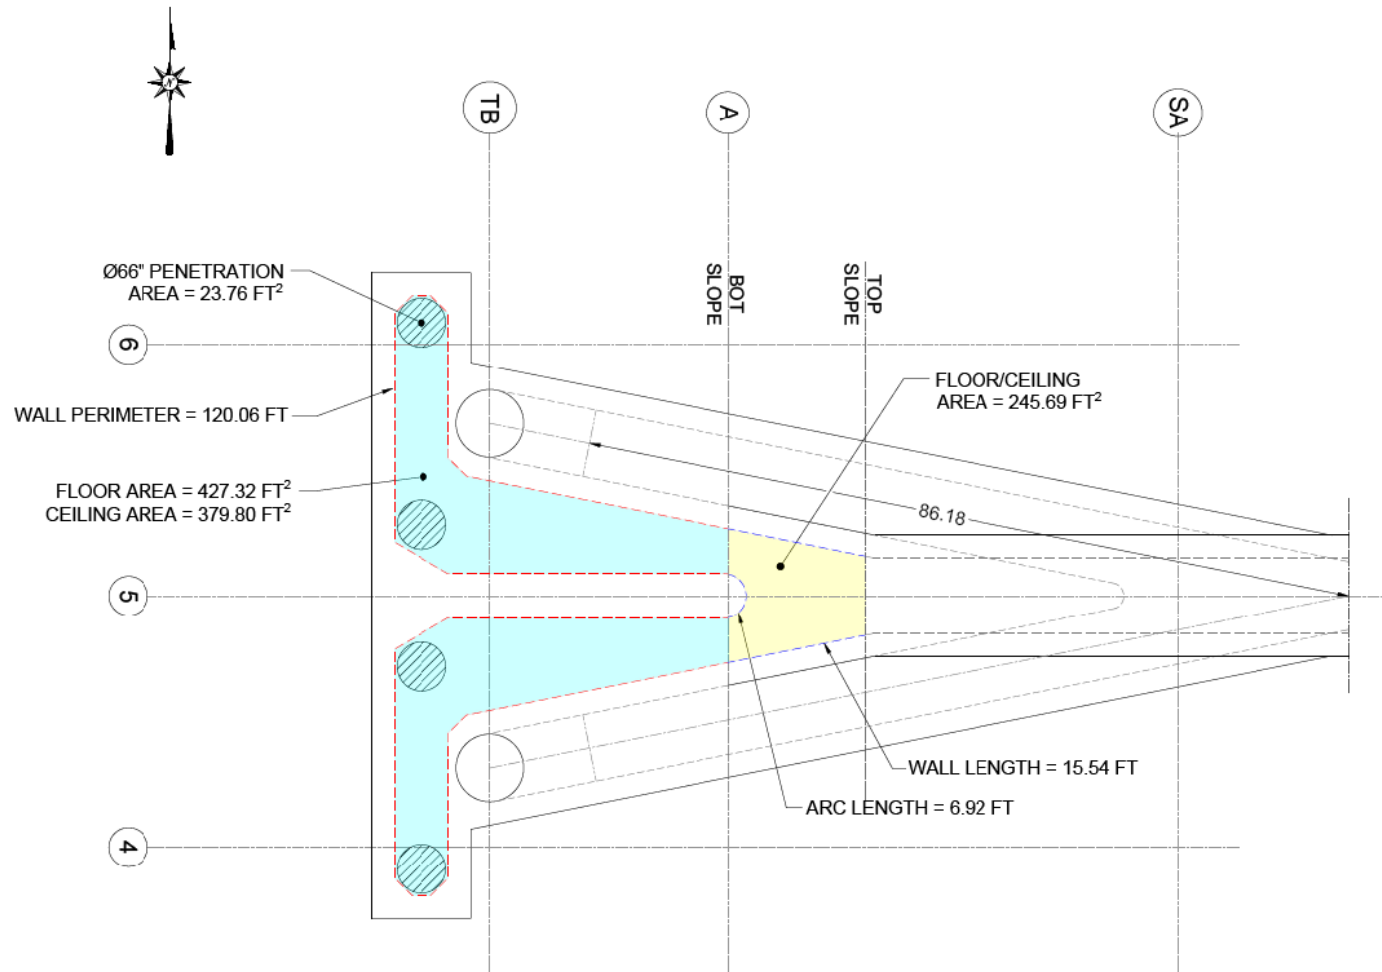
Intake Structure End State Elevations and Surface Areas
